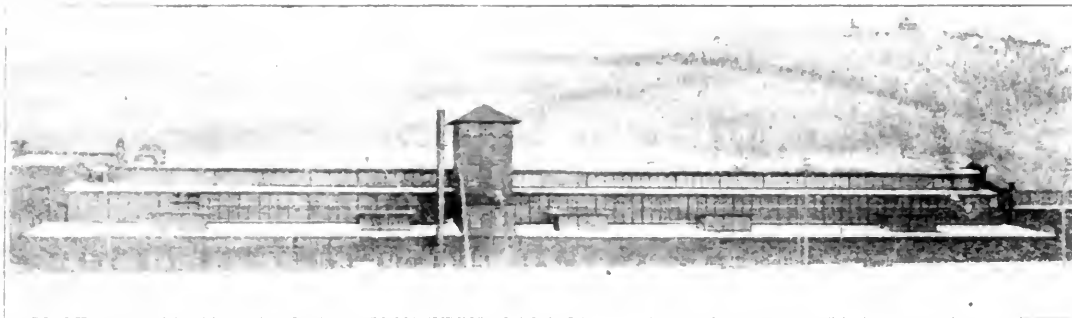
LONG ELEVATION OF BUILDING, VIEW FROM OVER THE CENTER, SHOWS THE LARGE AMOUNT OF GLASS IN ROOM.
